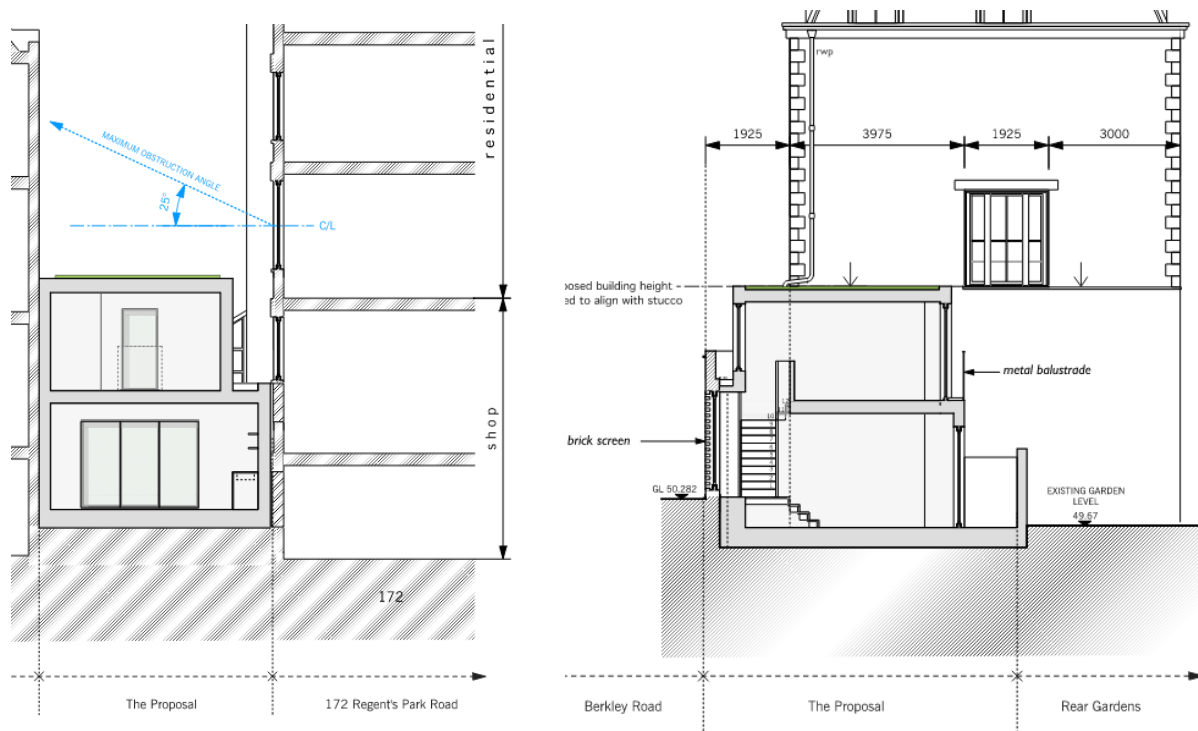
25-degree screening test for 172 Regent's Park Road (left) and elevation drawing showing lowest window to side elevation of 2 Berkley Road sits above development (right).
